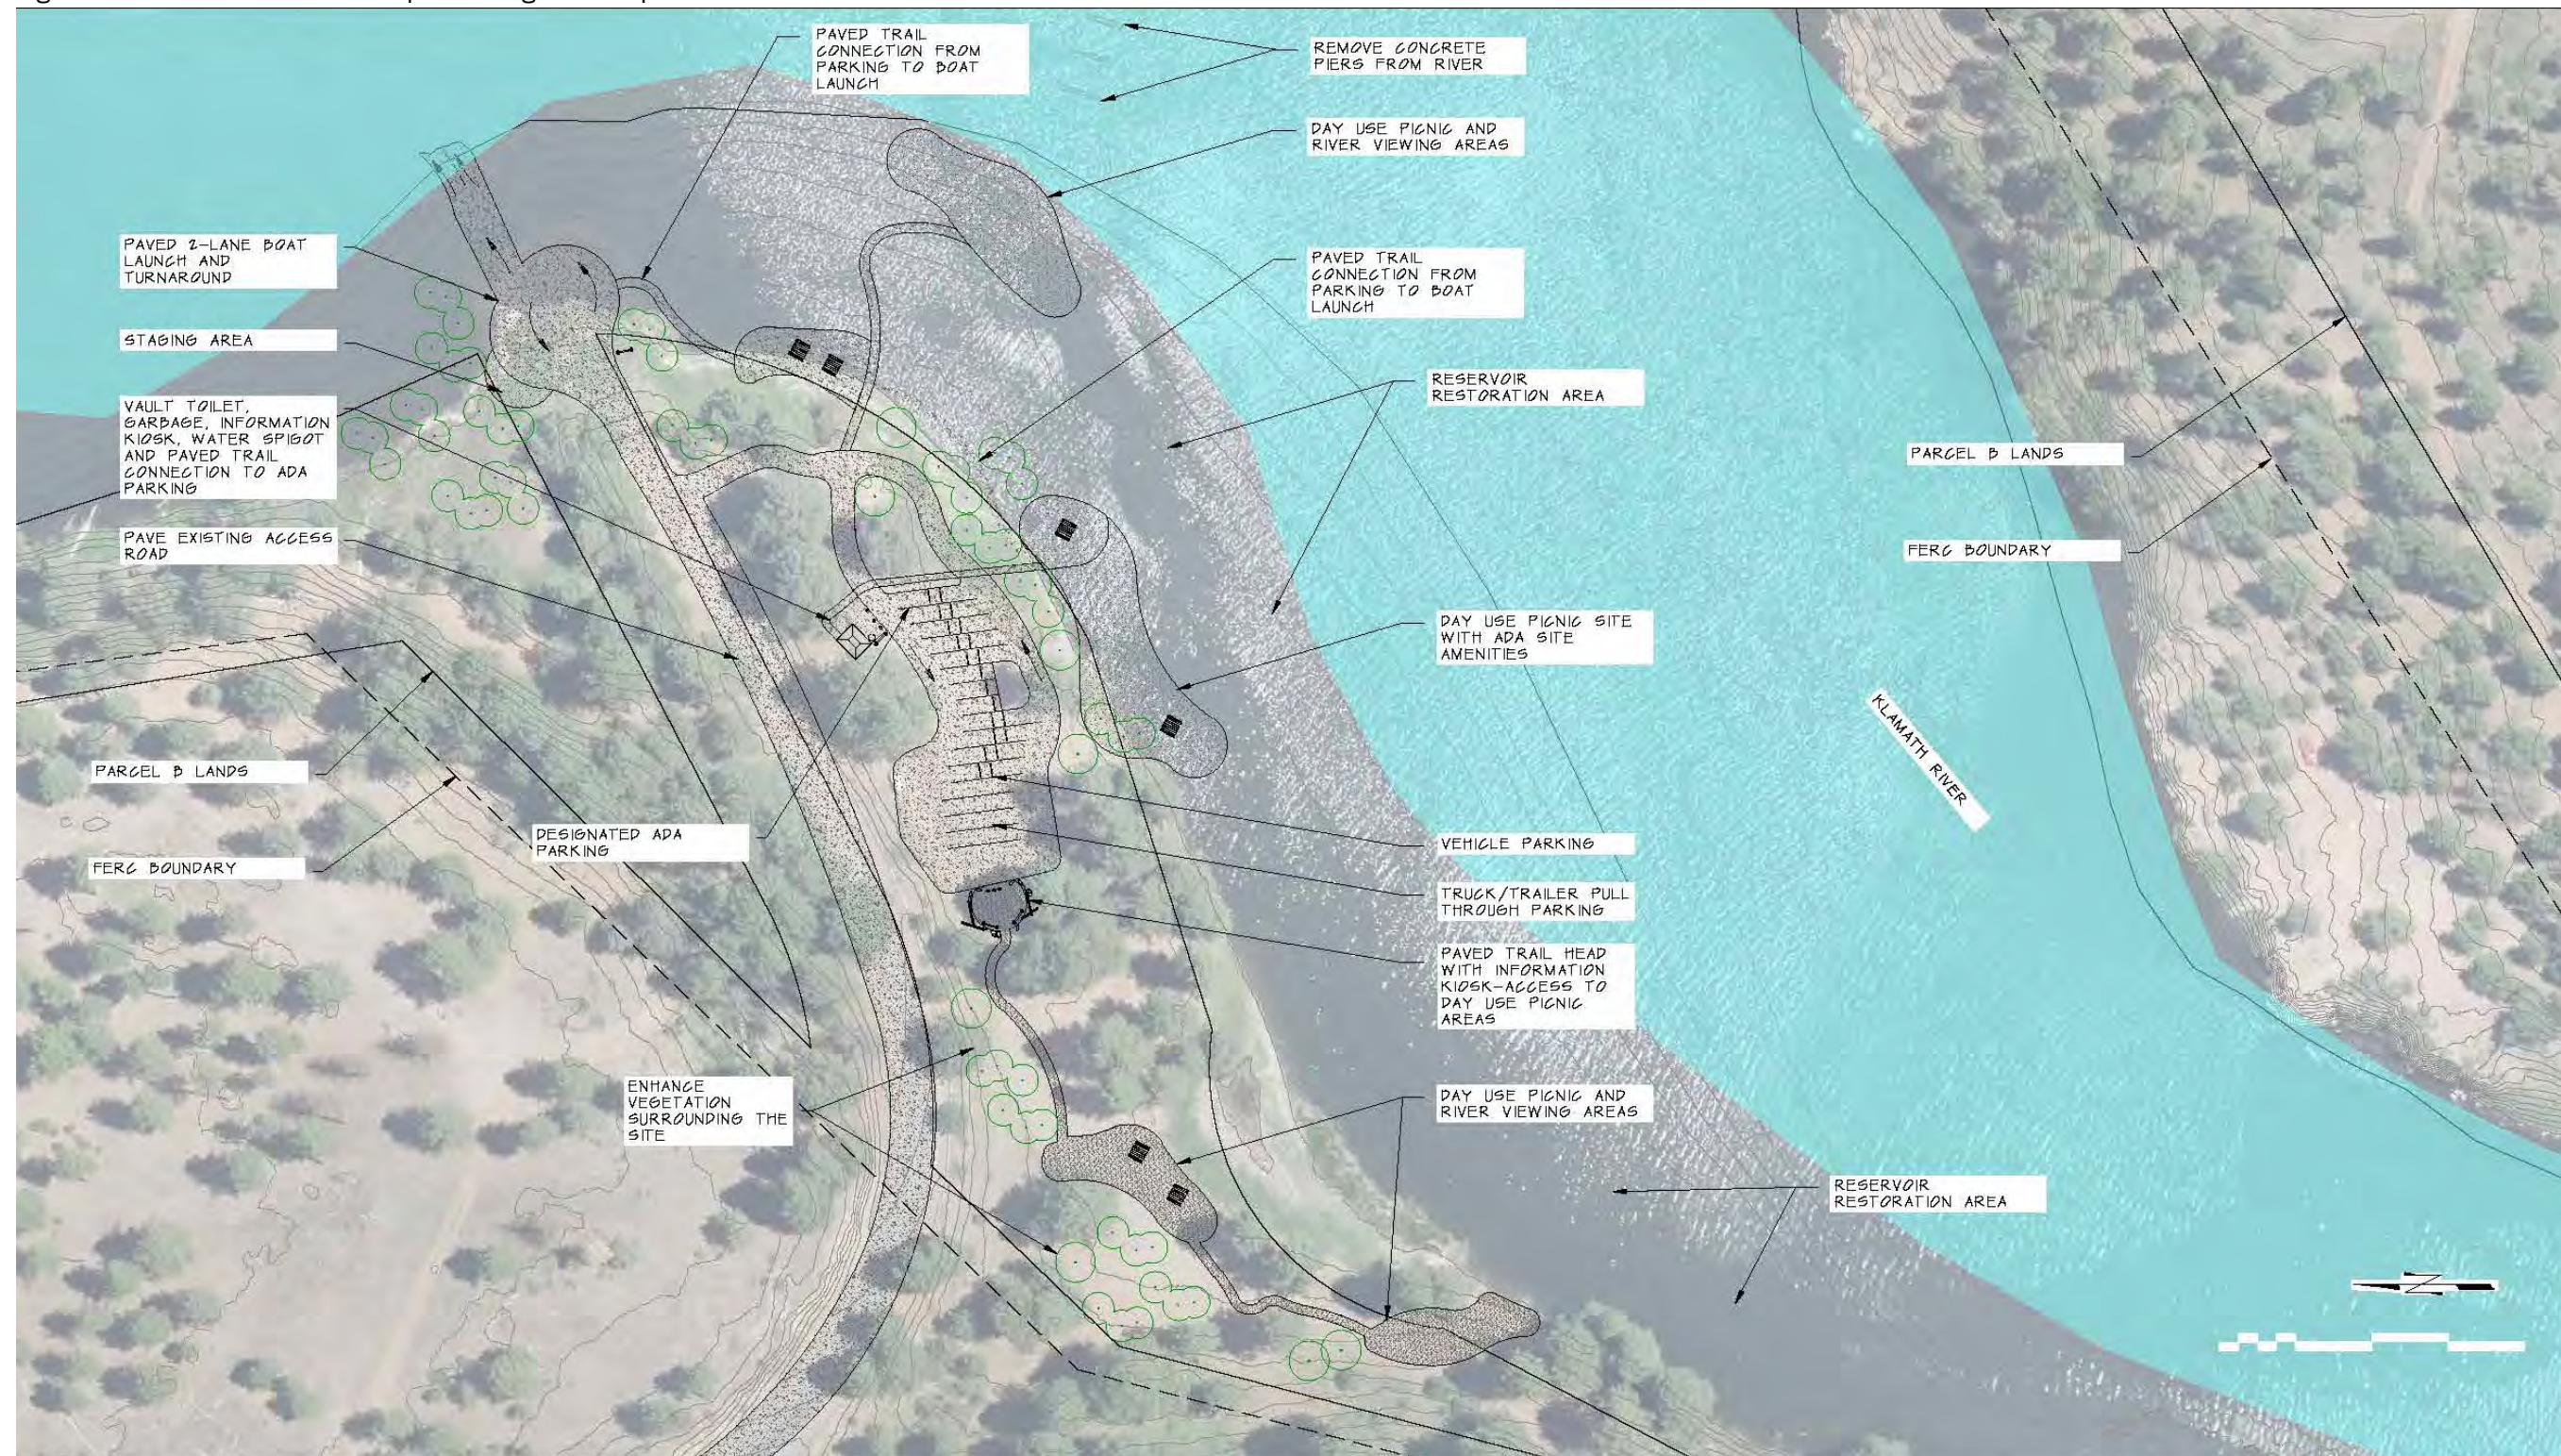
Pioneer Park West River Access Site Conceptual Design
